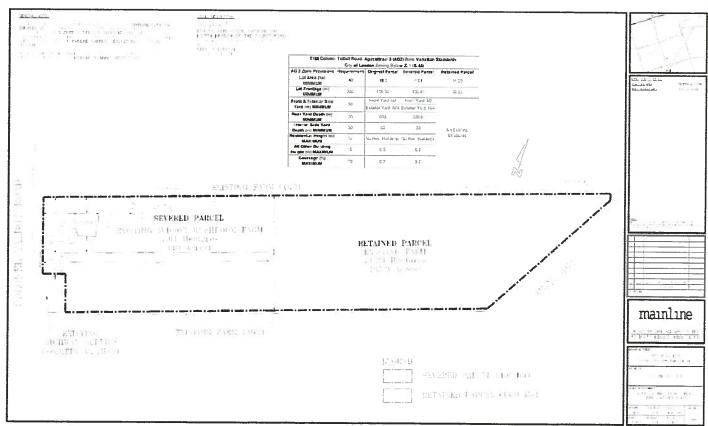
Site Sketch Showing Proposed Land to Be Severed and Land to Be Retained
